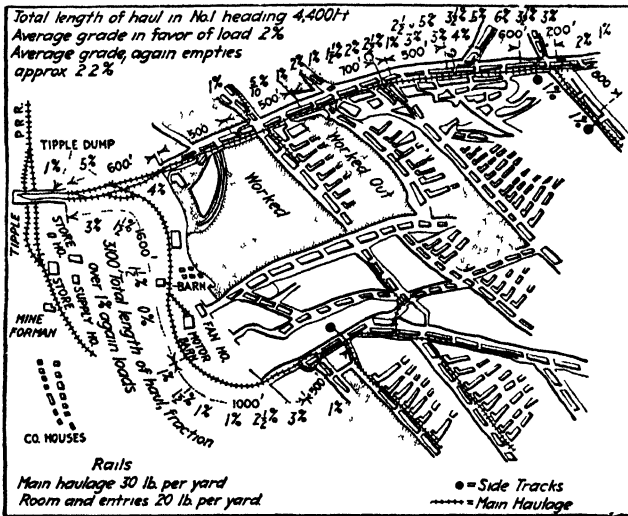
Haulage layout at Shade Coal Co's Mine in Pennsylvania
